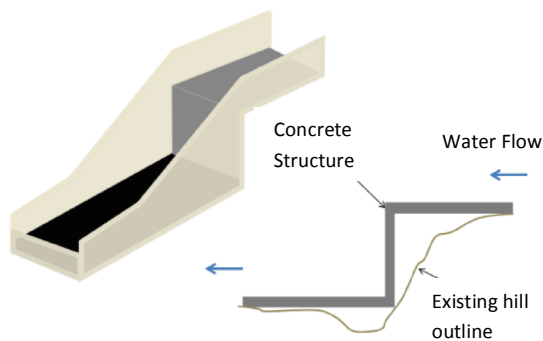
A concept sketch for the concrete drop box to be implemented at Junction 1.
